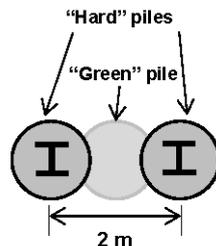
Adopted arrangement of secant pile walls (Note: shown reinforcement type in indicative only)
